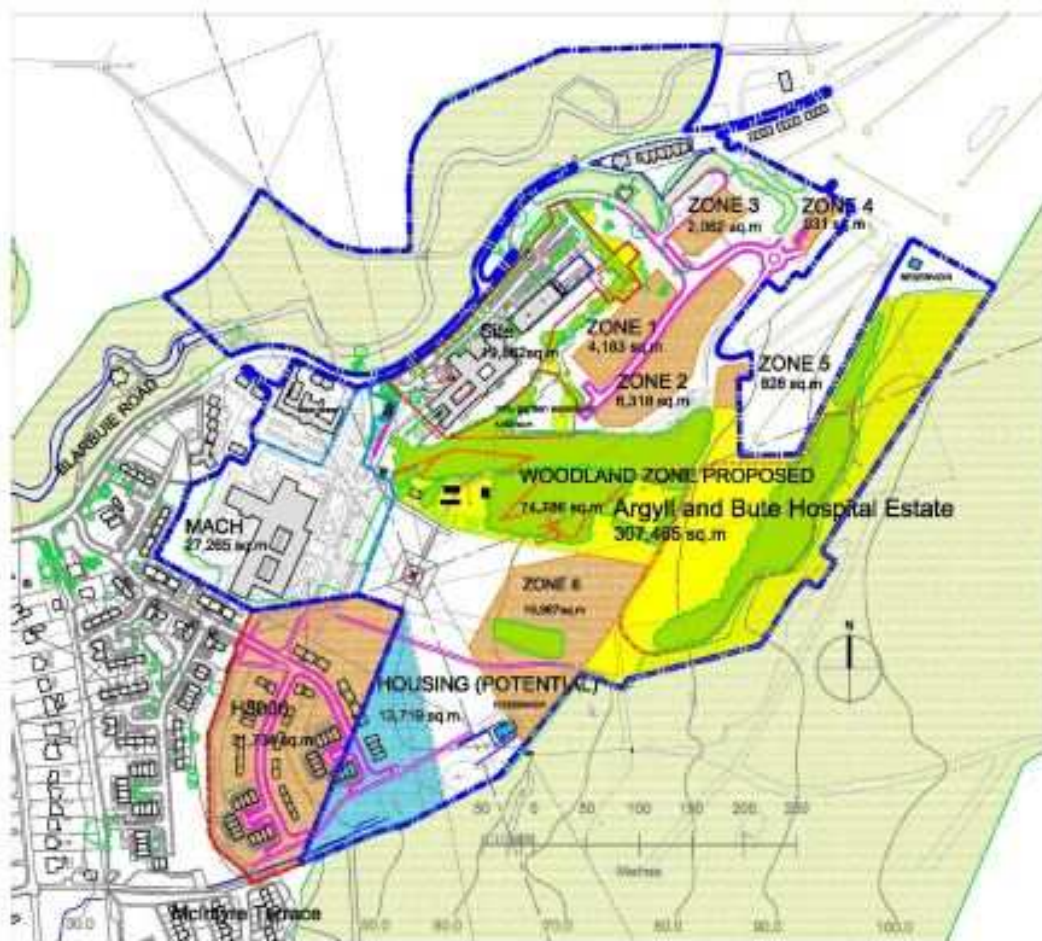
Base Development Plan, Argyll and Bute Hospital buildings demolished and new road infrastructure.
